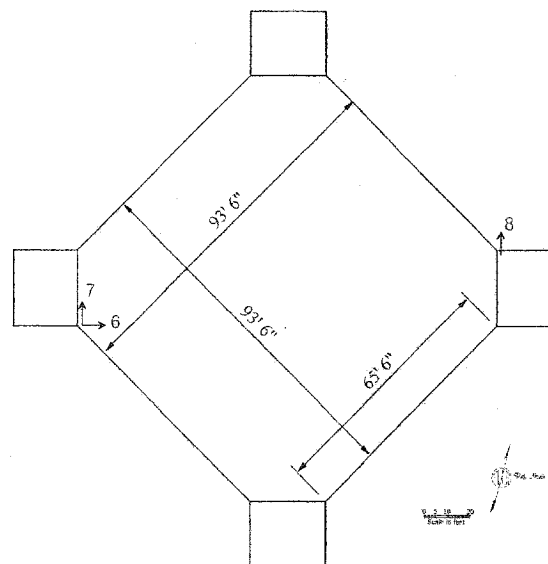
Sensor Locations (Channels 6, 7, 8) in the 1st Floor
